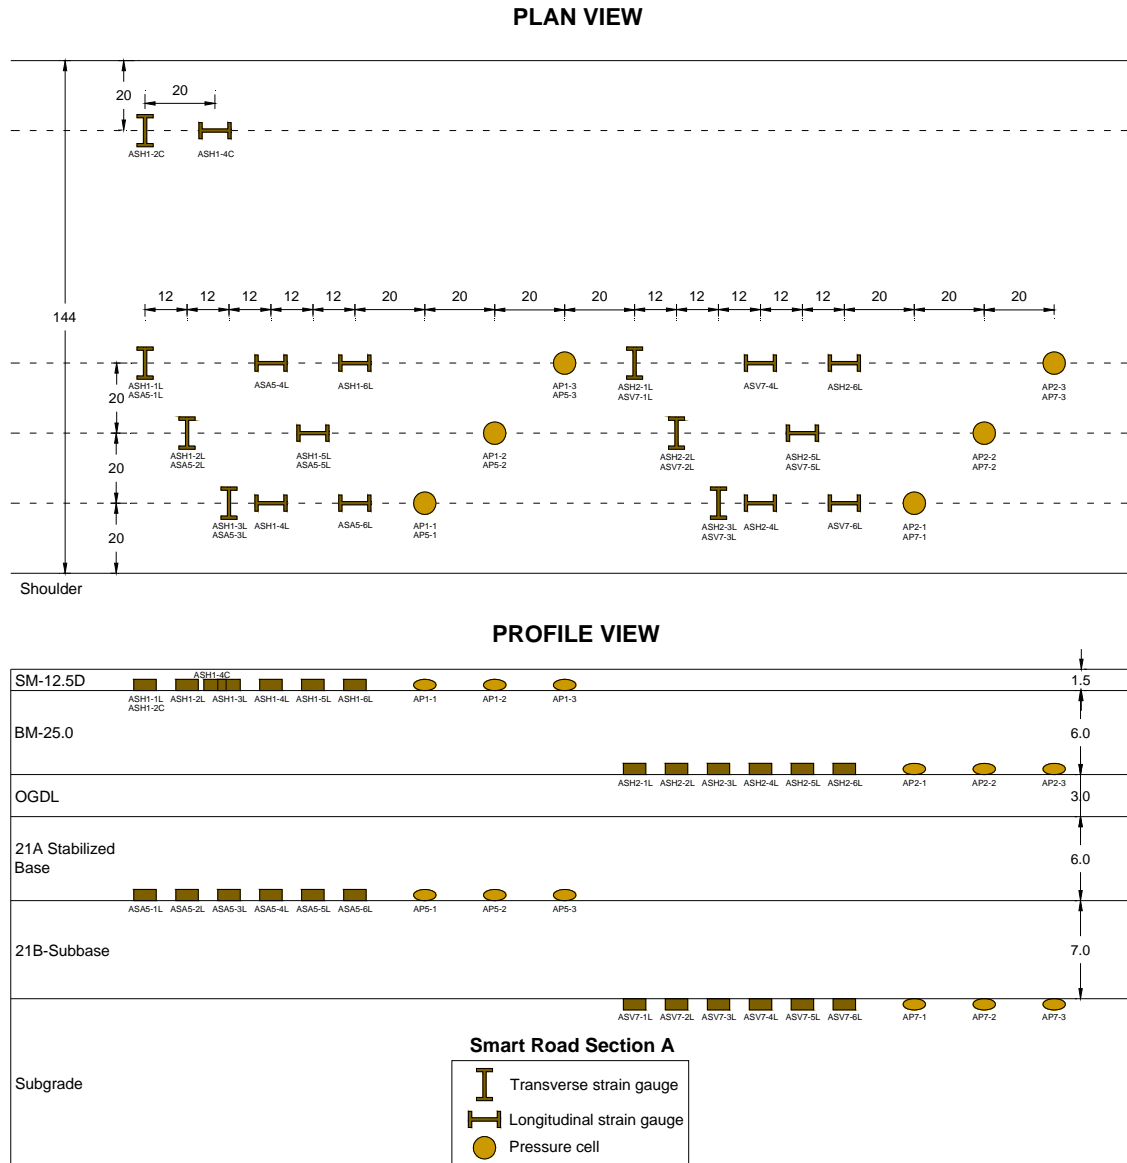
Plan and profile view of pavement structure and instrumentation of Section A, Virginia Smart Road
